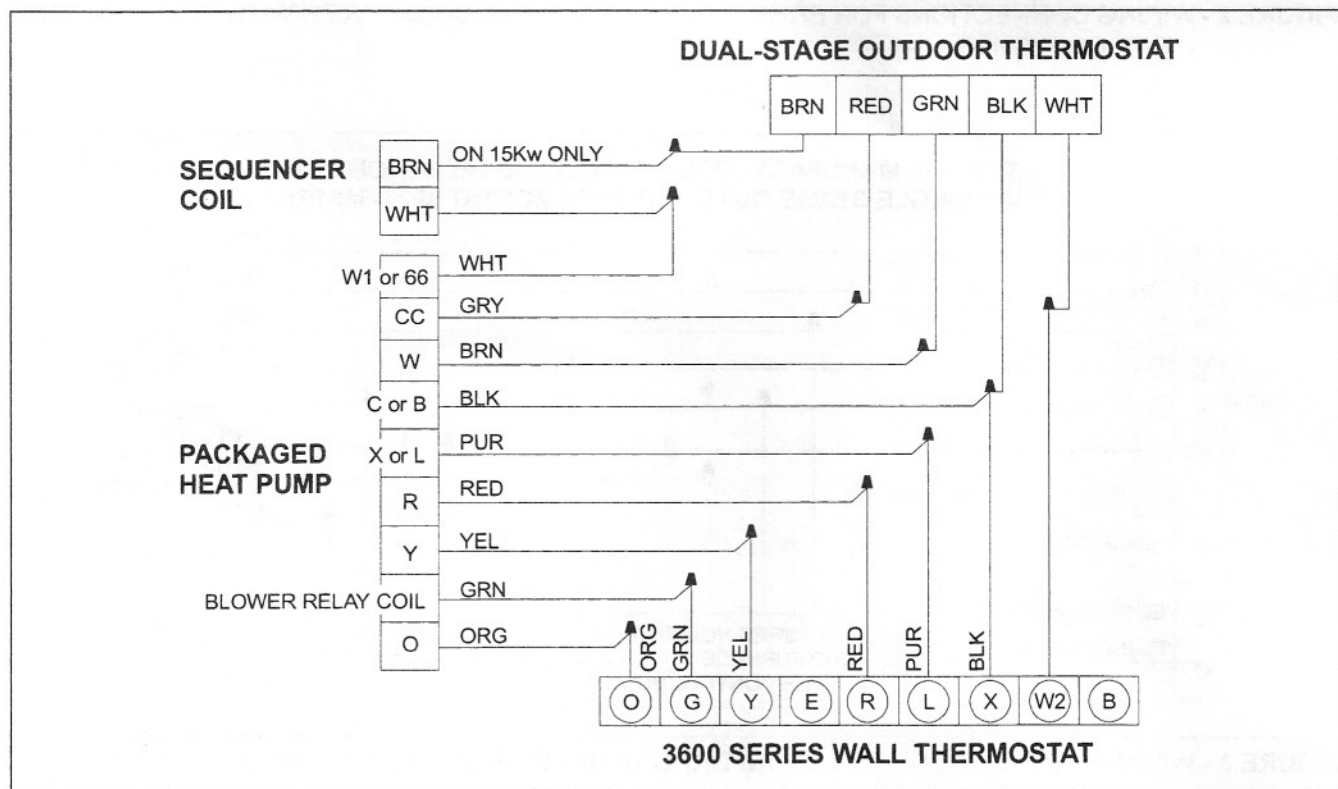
WIRING CONNECTIONS FOR PHP PACKAGED HEAT PUMP
